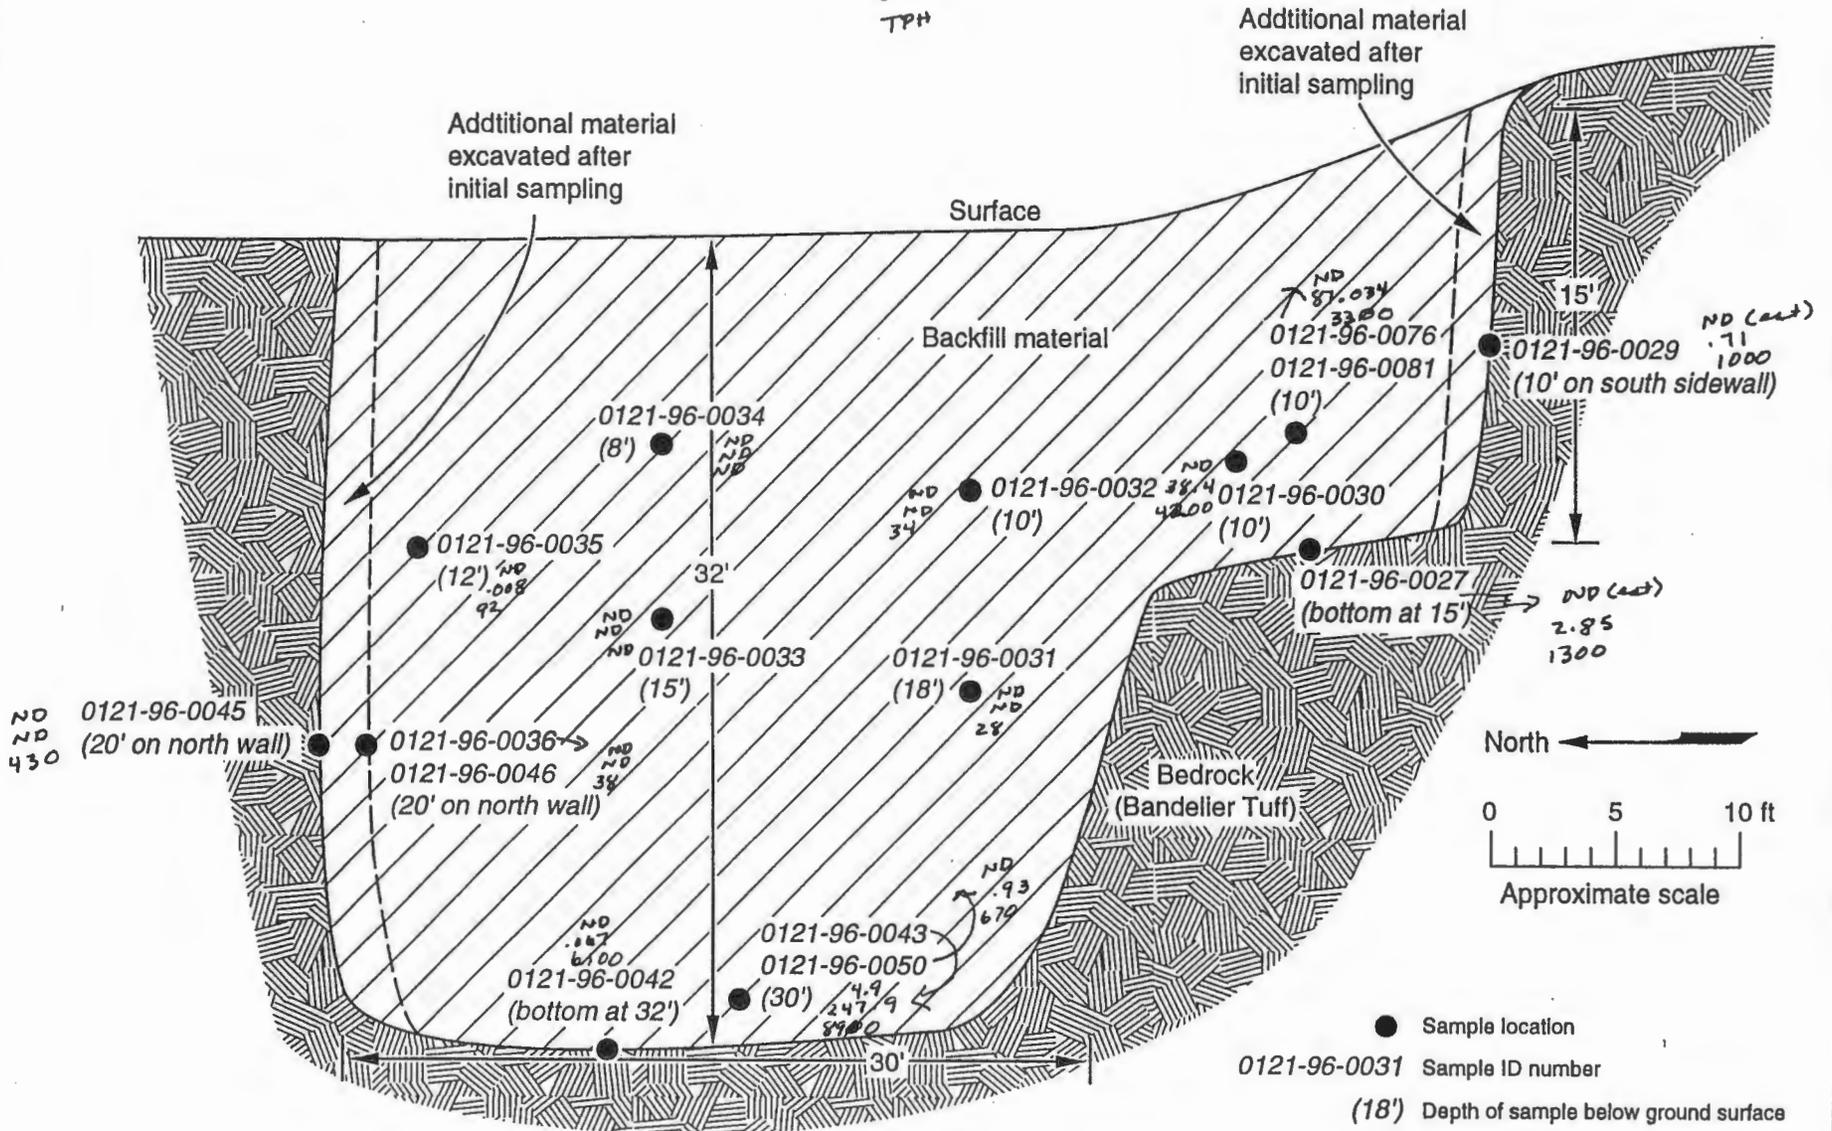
Approximate locations of confirmatory samples collected from east sidewall of excavation.
